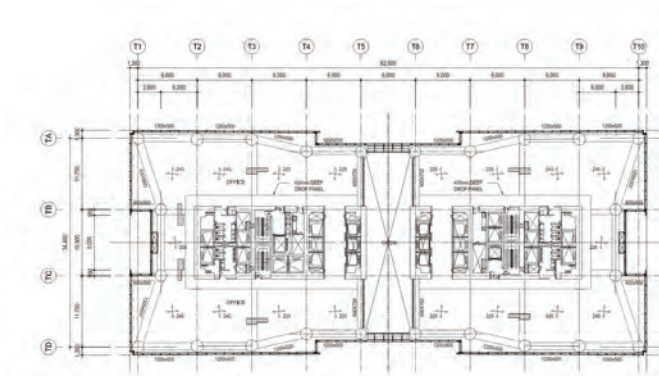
Typical Atrium Floor Framing (Source: Thornton Tomasetti)
